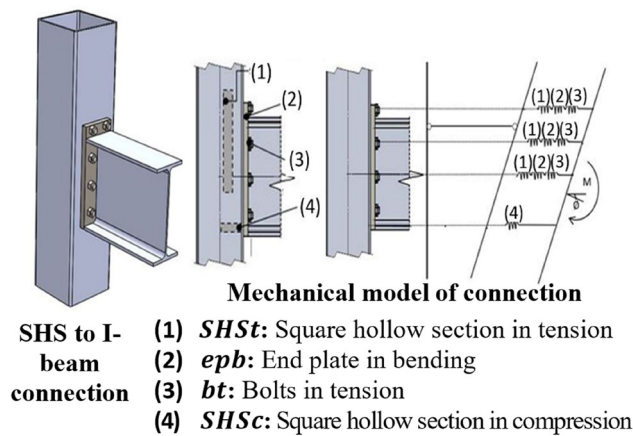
Model for rigidity calculation of the hollow column without concrete
